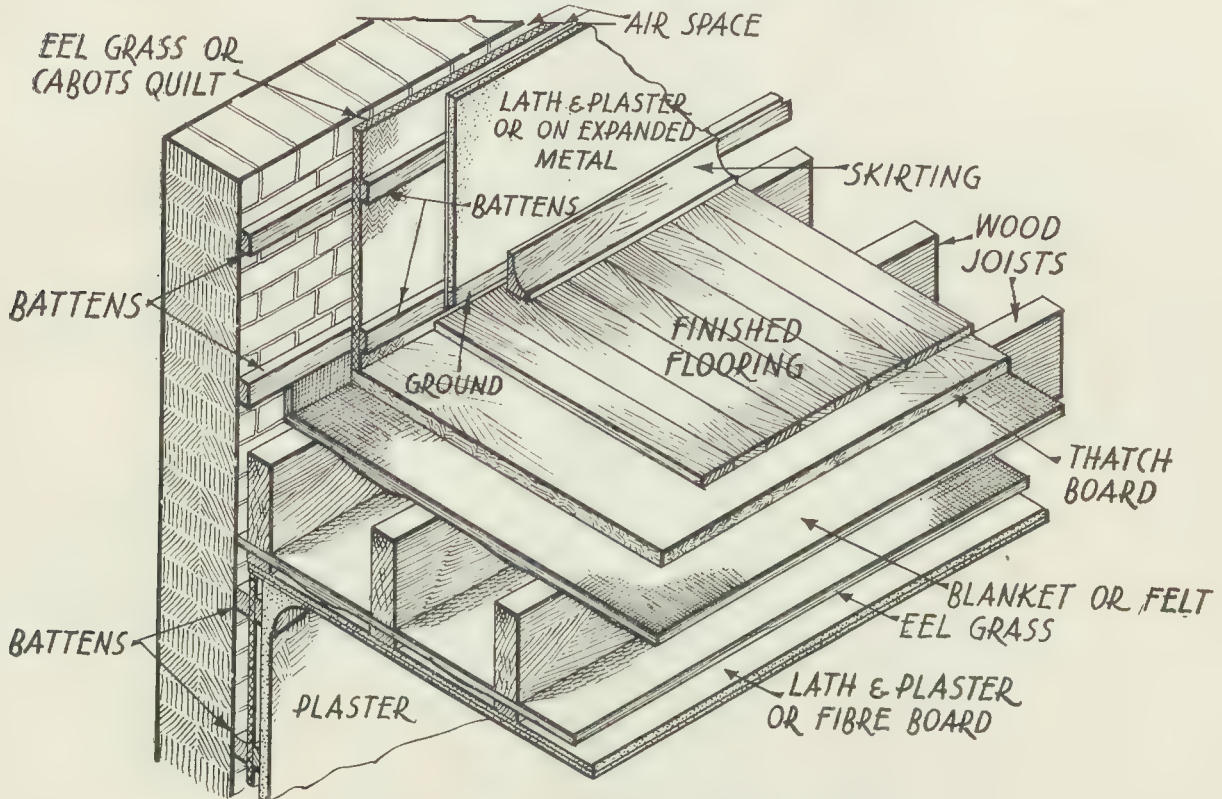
SOUND-PROOFING TIMBER UPPER FLOORS
